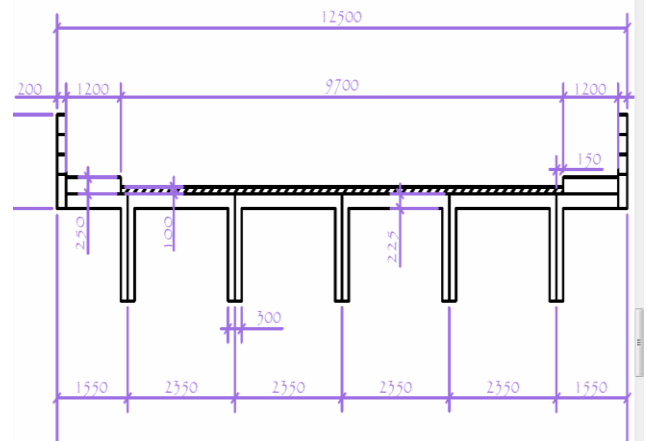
Cross-Sectional View of 4-Span T-Beam Bridge
